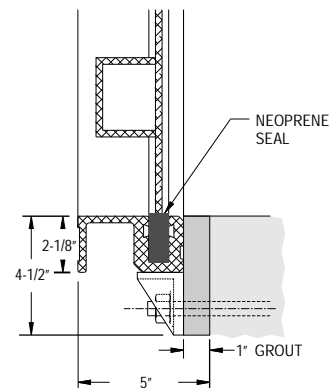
761- Aluminum Flat Frame End-of-Channel Mounting; Section BB
